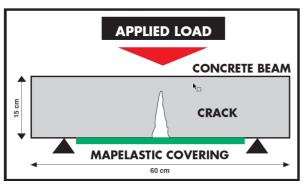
Protection of a hairline crack to a concrete beam subject to flexural stress, coated with Mapelastic to the underside
